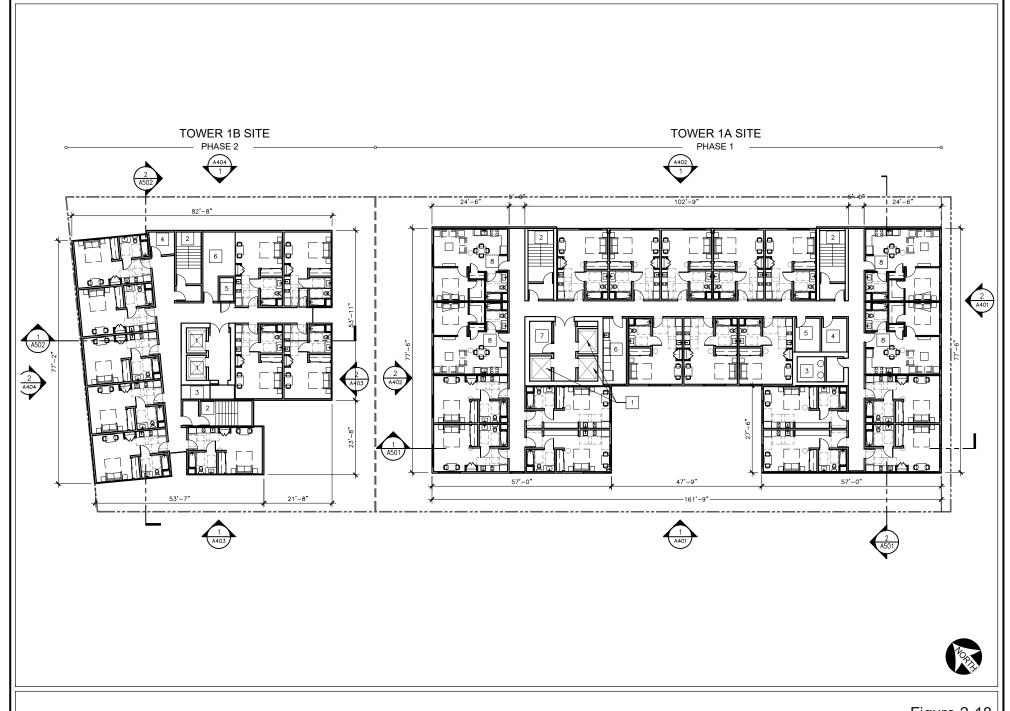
Level 8 and 9 Floor Plan - Site 1
